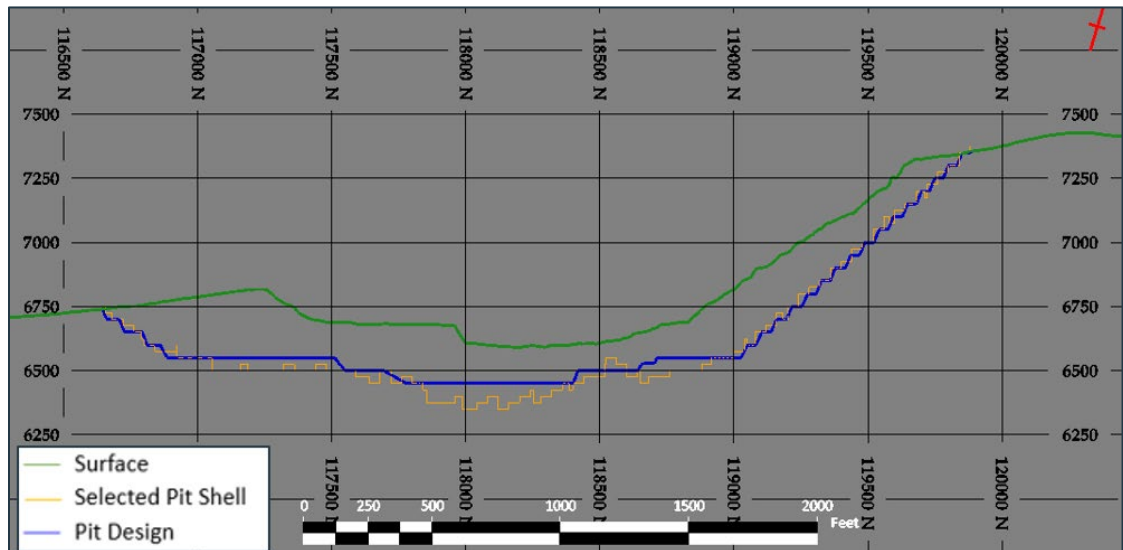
Ultimate Pit Design – Beartrack North Pit (Source: Wood, 2020)
